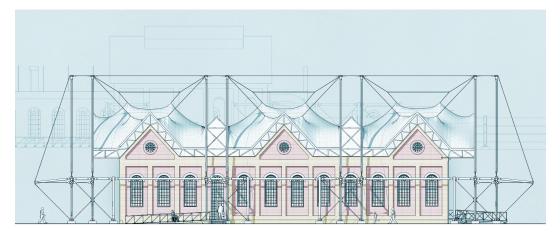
Elevation of renovated Powerhouse, part of a proposal at Crumlin Navigation Colliery for Renewable Energy Storage Facility (Luckman, R., 2022)
